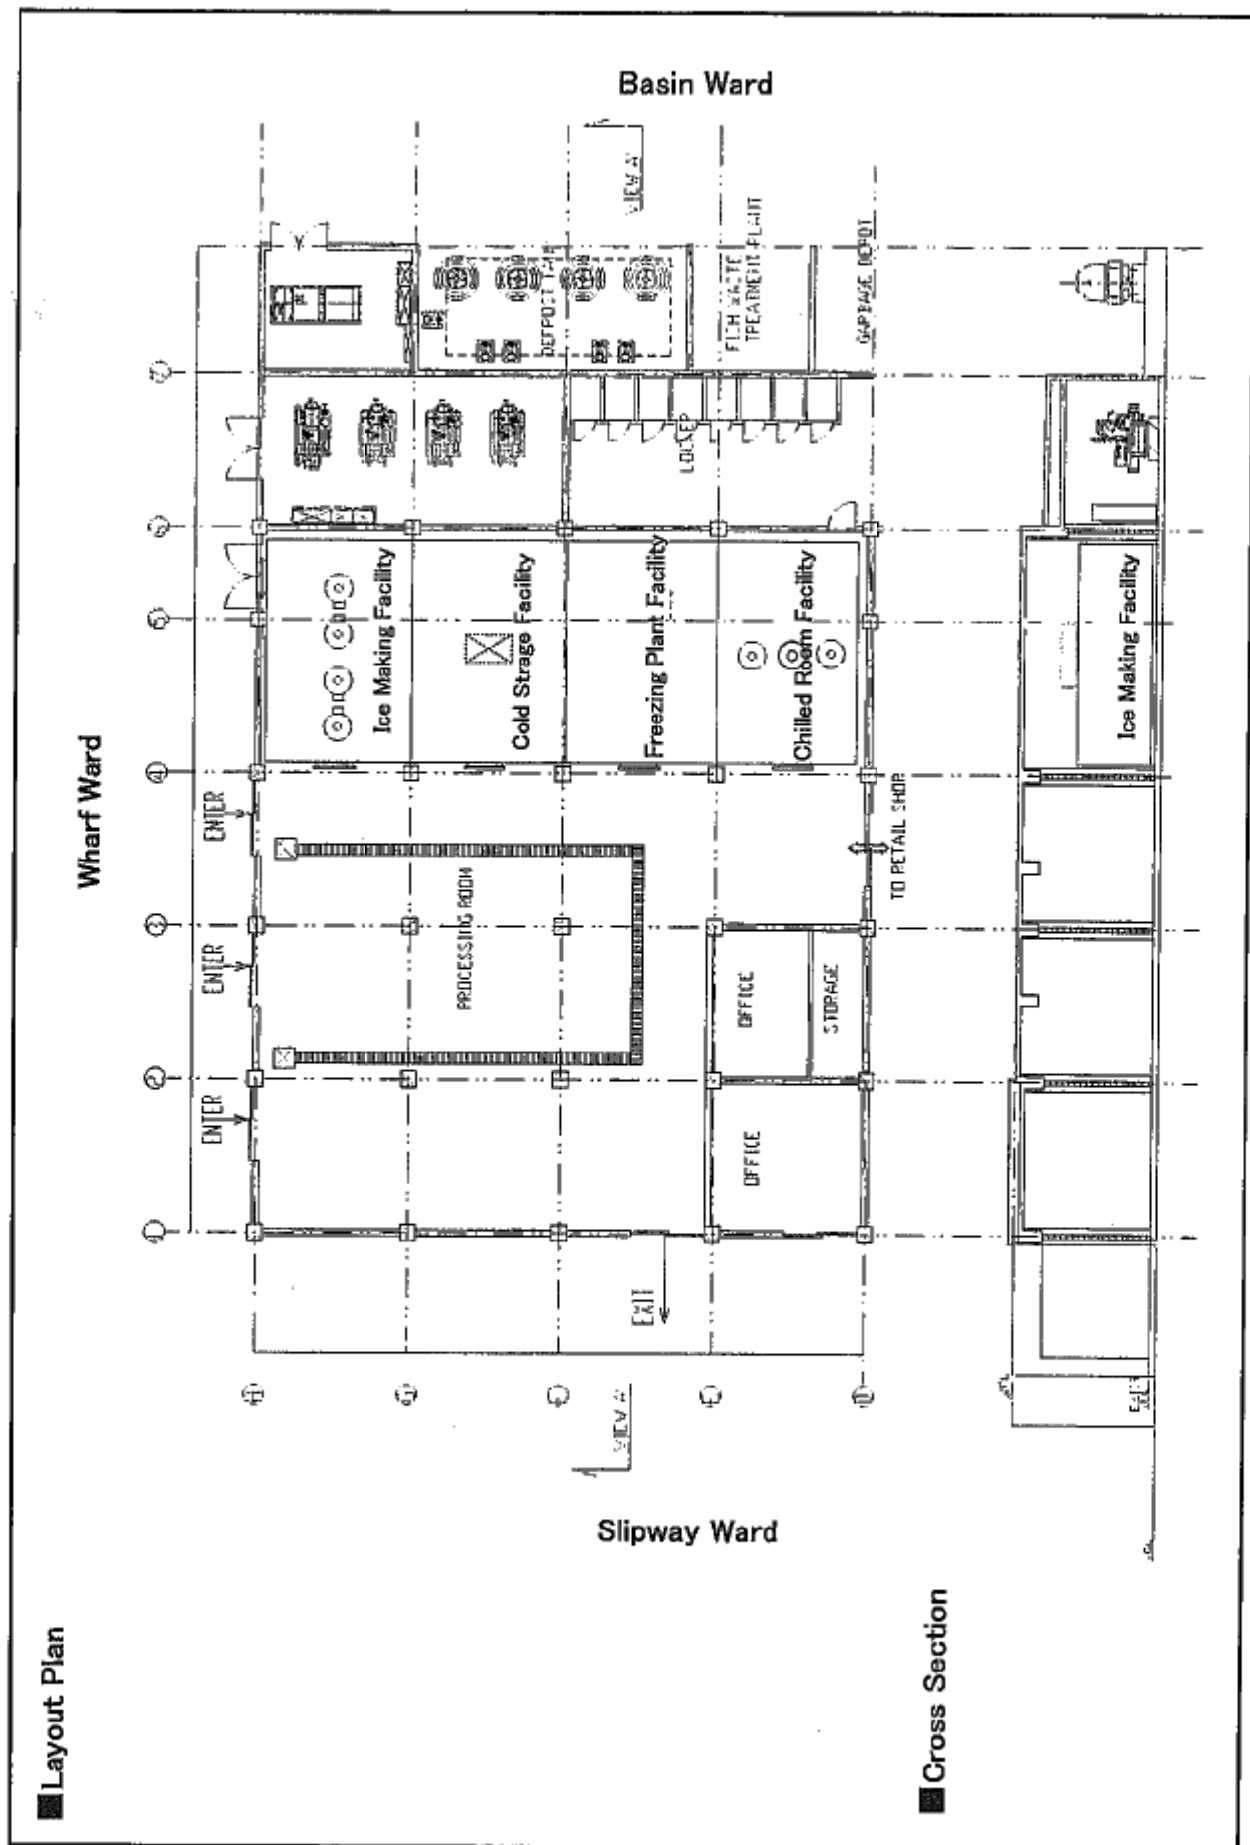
(3) Existing Plan and Cross Section of Fisheries Center, Ground Floor
